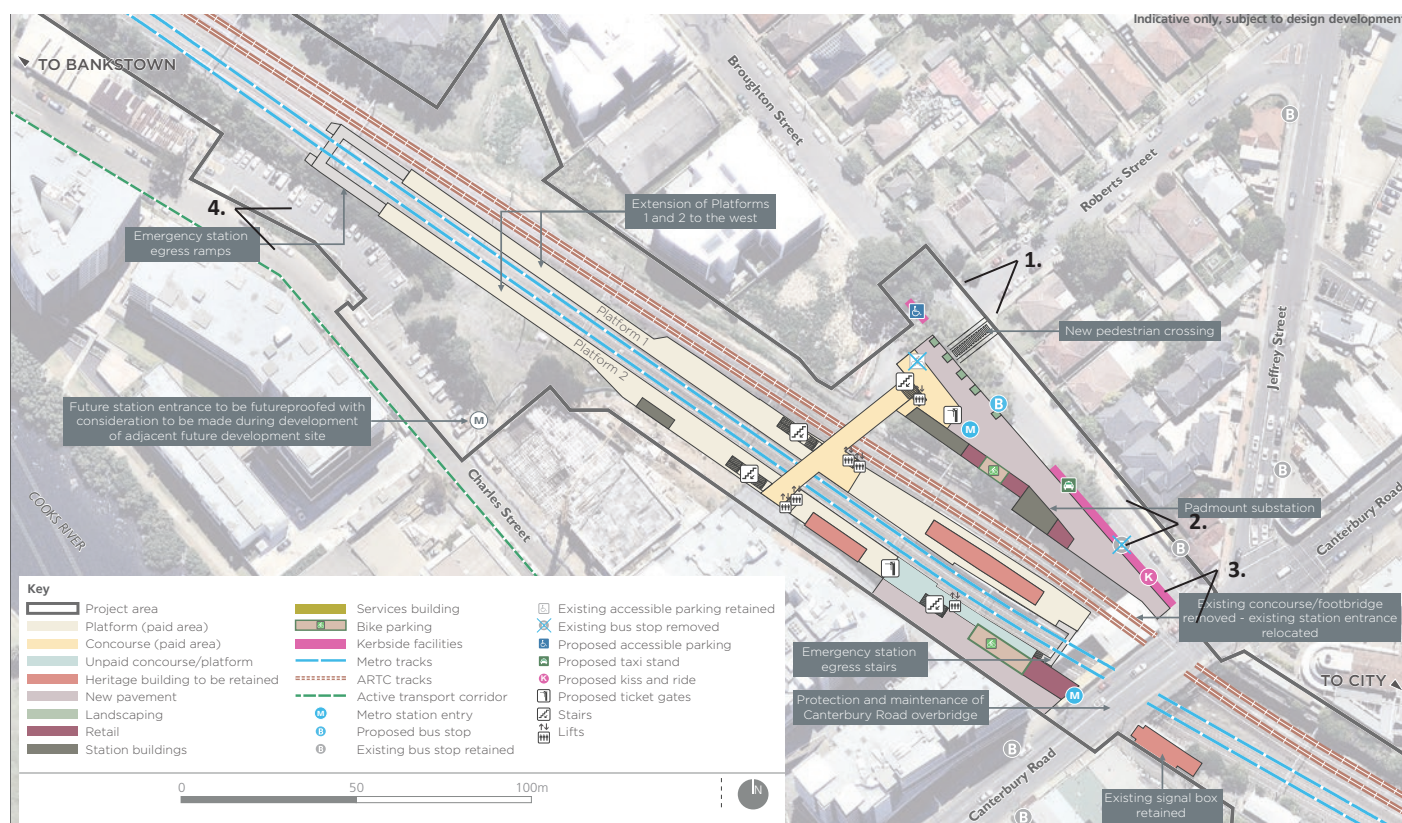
VIEWPOINT LOCATION PLAN
